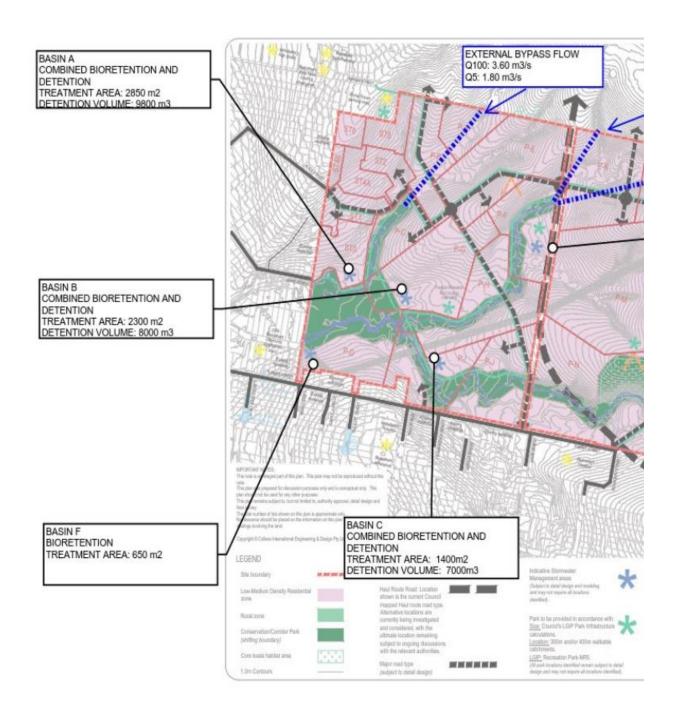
Conceptual Stormwater Management Plan – showing proposal area
